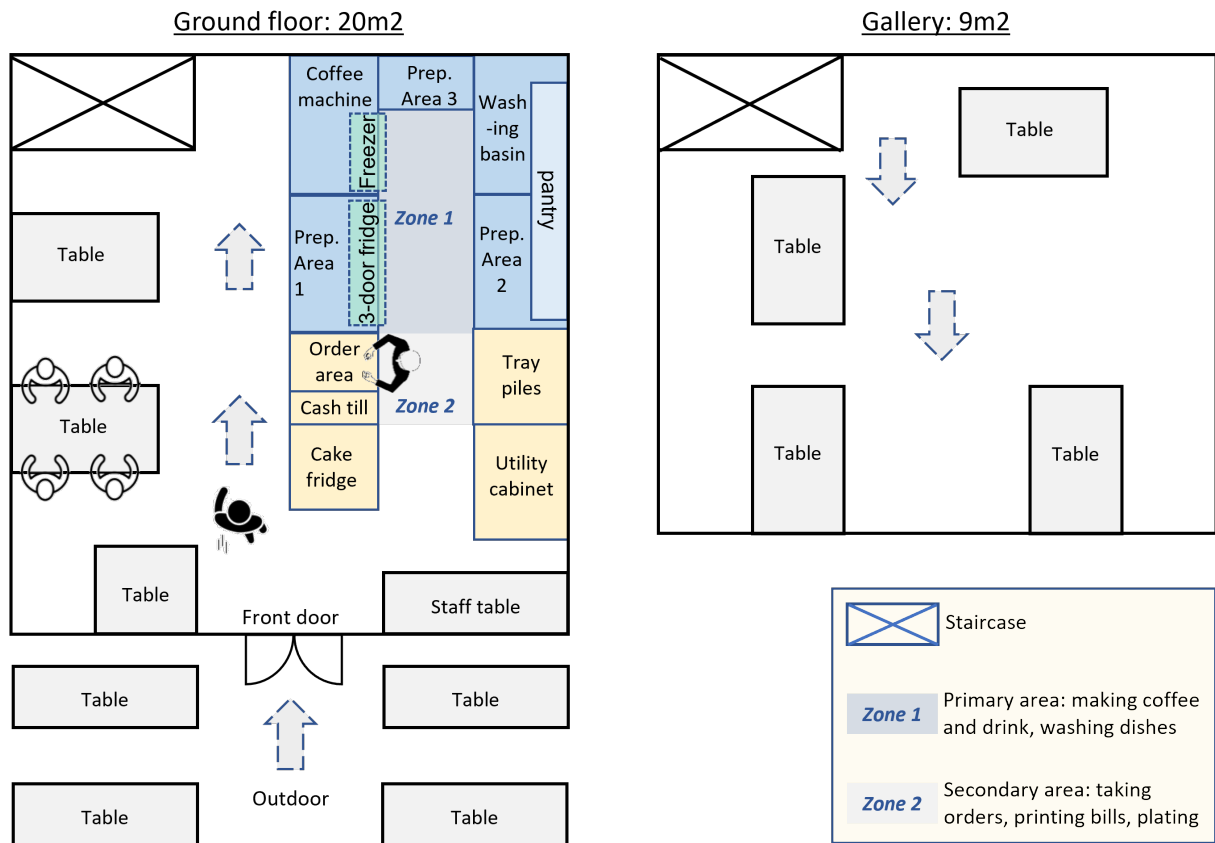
Floor plan of the studied coffee shop: The ground floor with indoor tables (left) and the gallery with indoor tables (right).
